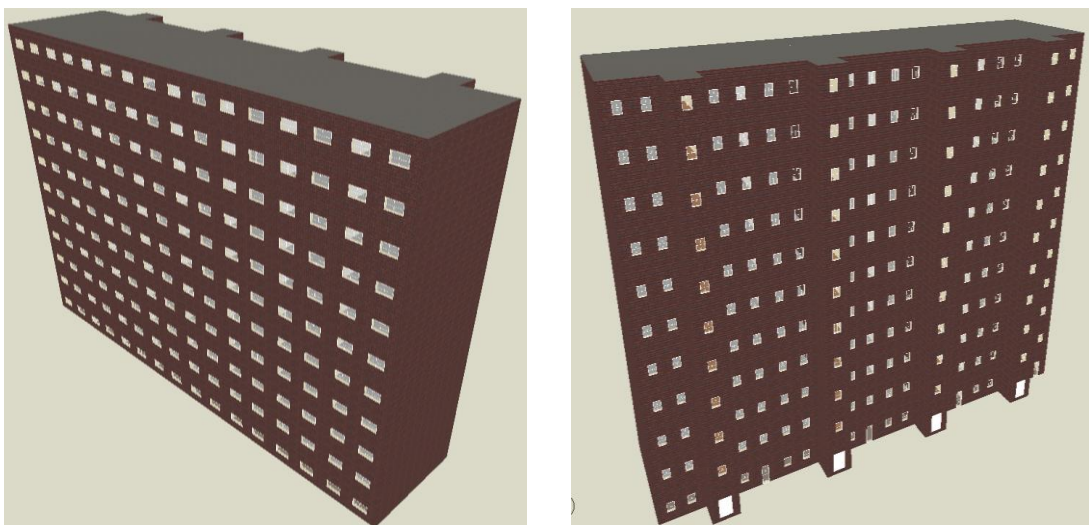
3D view of the buildings' south (left) and north façades (right).
